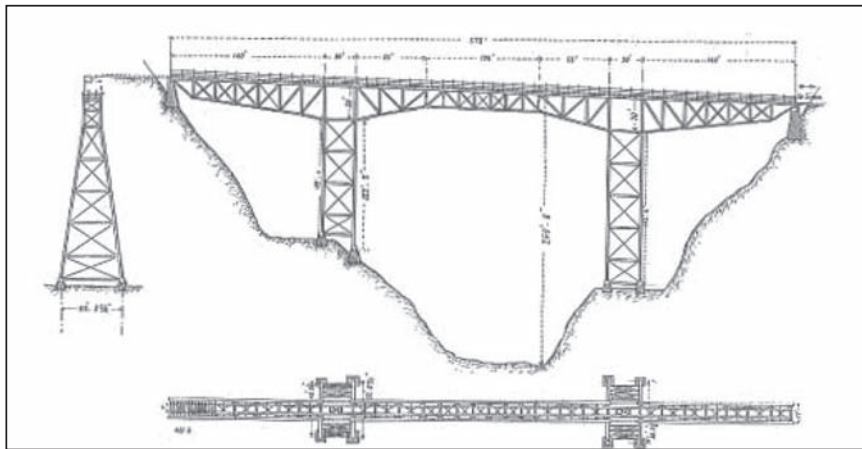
Plan, elevation and transverse view of new Verrugas Viaduct.
